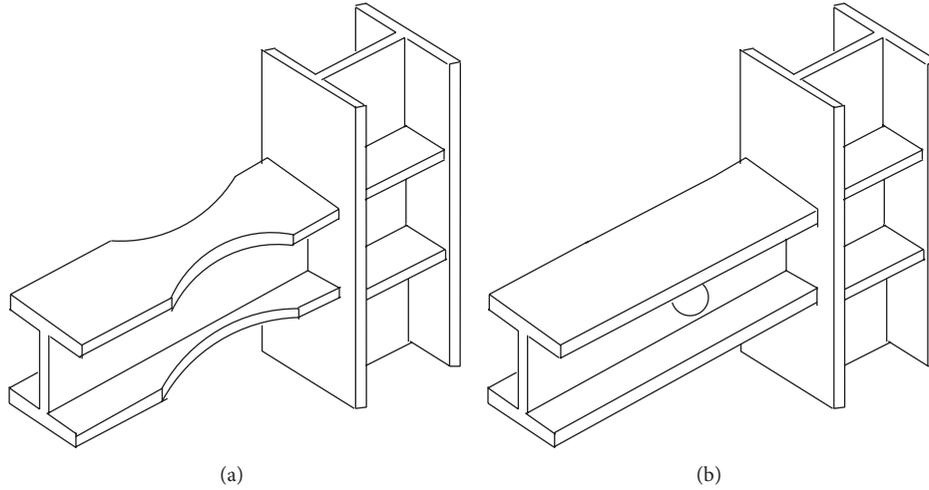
(a) Flange slab weakened steel connection and (b) web plate groove weakened steel connection.
